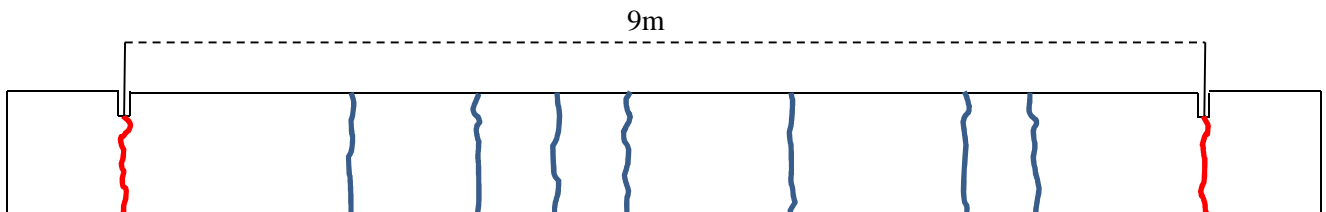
The crack pattern of a 9 m joint spacing slab containing 5kg/m³ fibres
